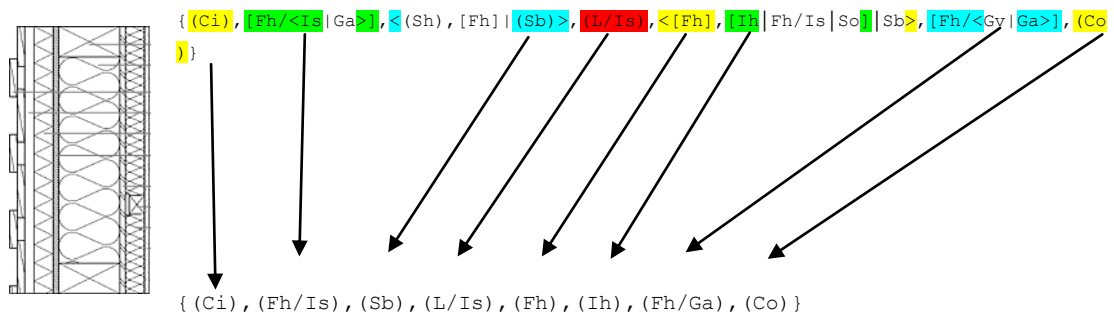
Outside wall construction awrohi01b (Source: www.dataholz.com)
